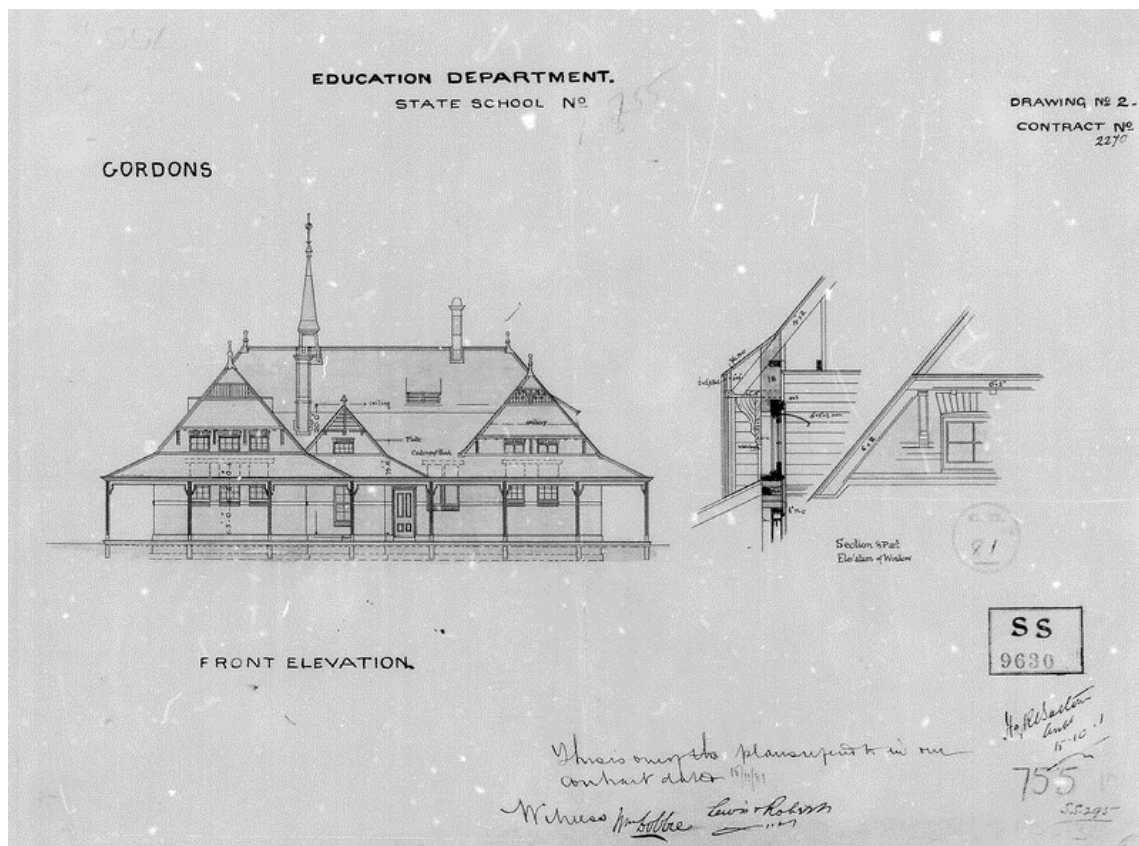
H.R. Bastow, Gordons State School No. 755, Front elevation & Section Detail, 1881.
